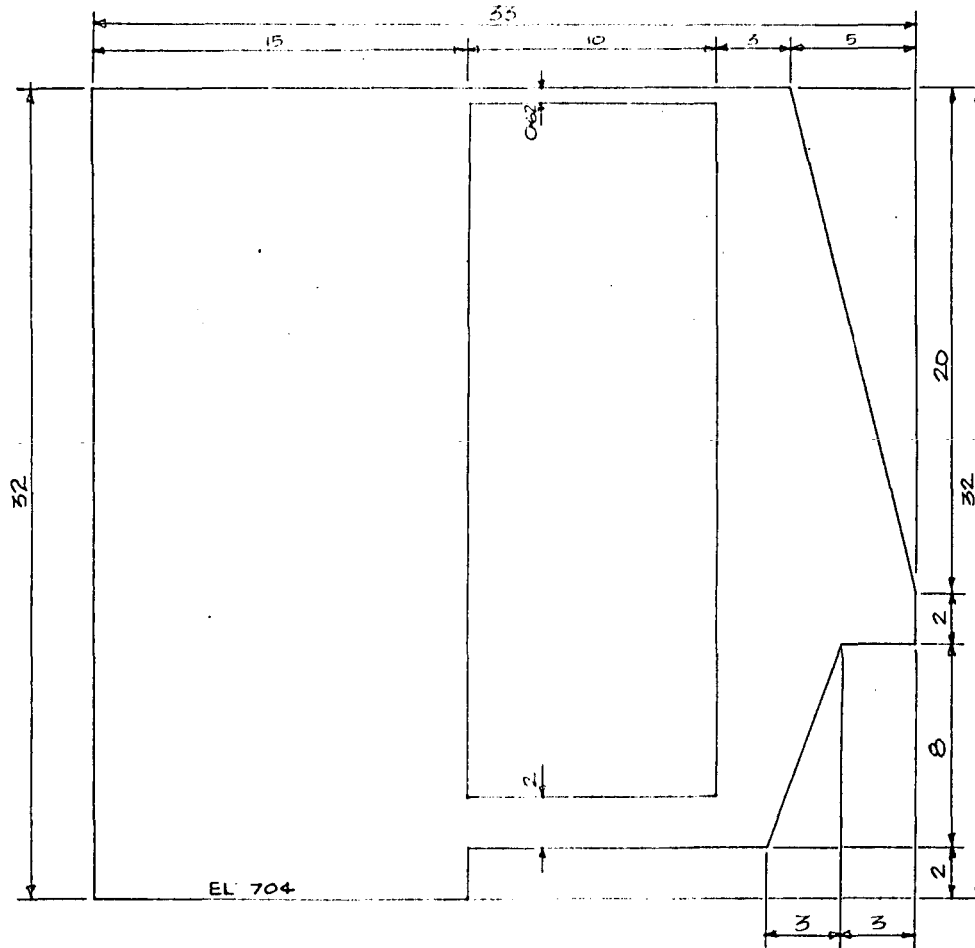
LAND WALL - LOCK CHAMBER L-32
